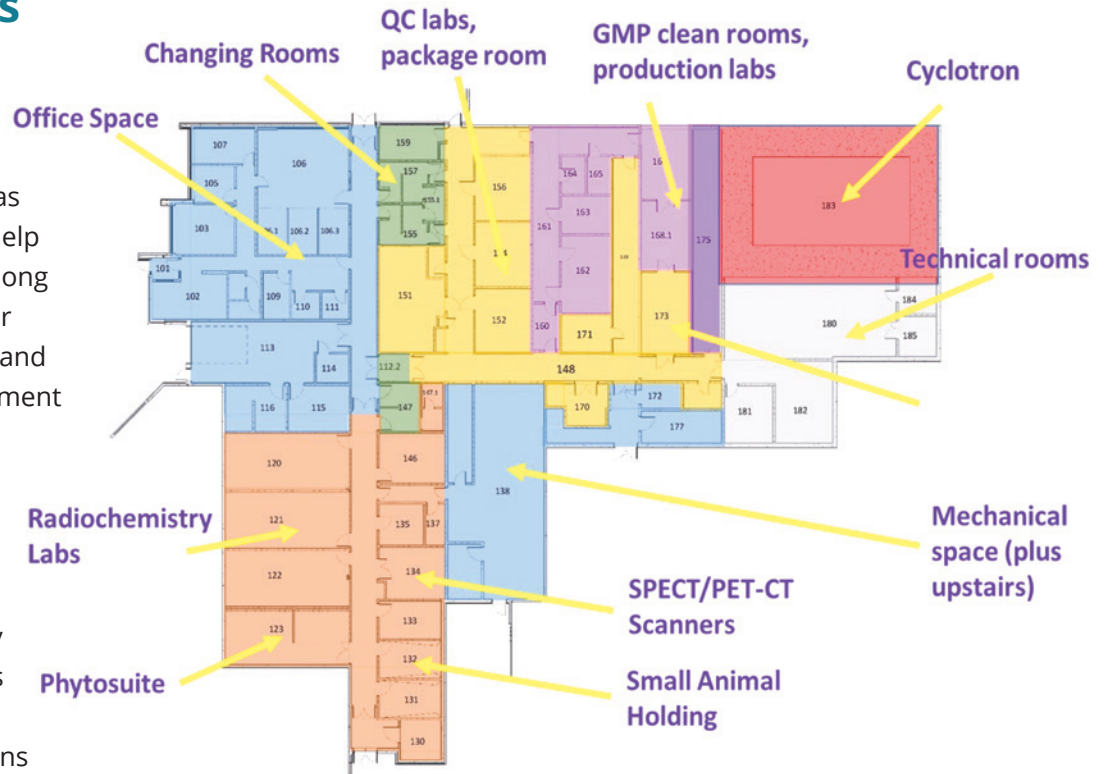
Floor plan of the Saskatchewan Cyclotron Facility
